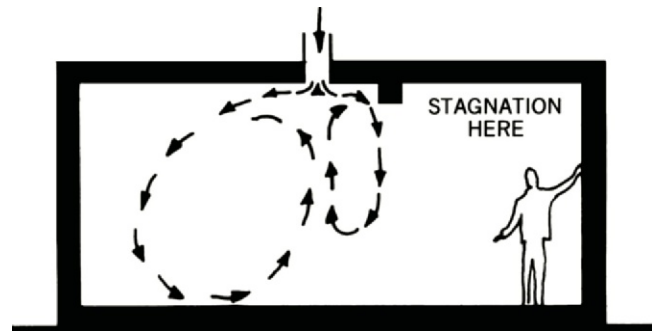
Locate air outlets carefully to avoid blocking the airflow with beams or other obstructions.
